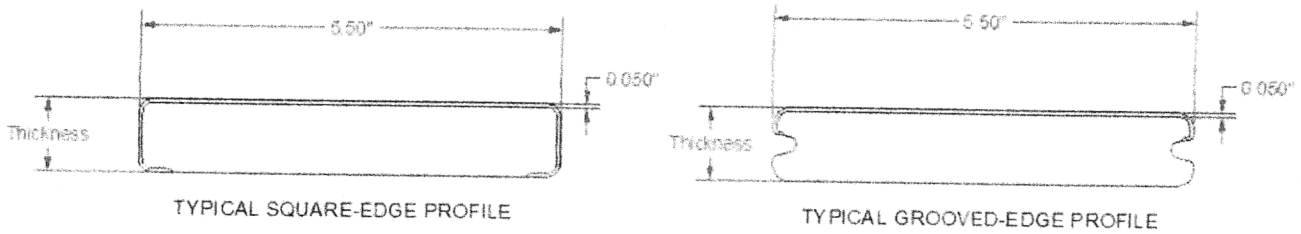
TYPICAL TREX<sup>®</sup> DECK BOARD PROFILES
